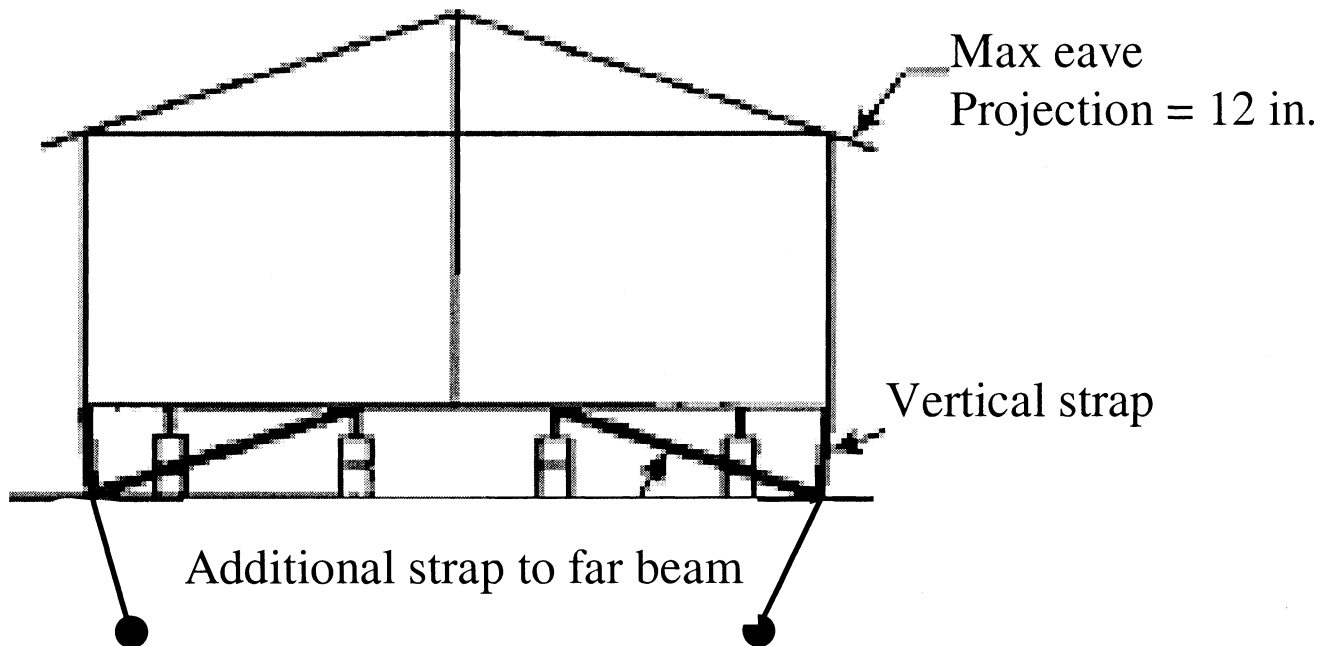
,402 - Anchor Strap and Pier Relationship.
